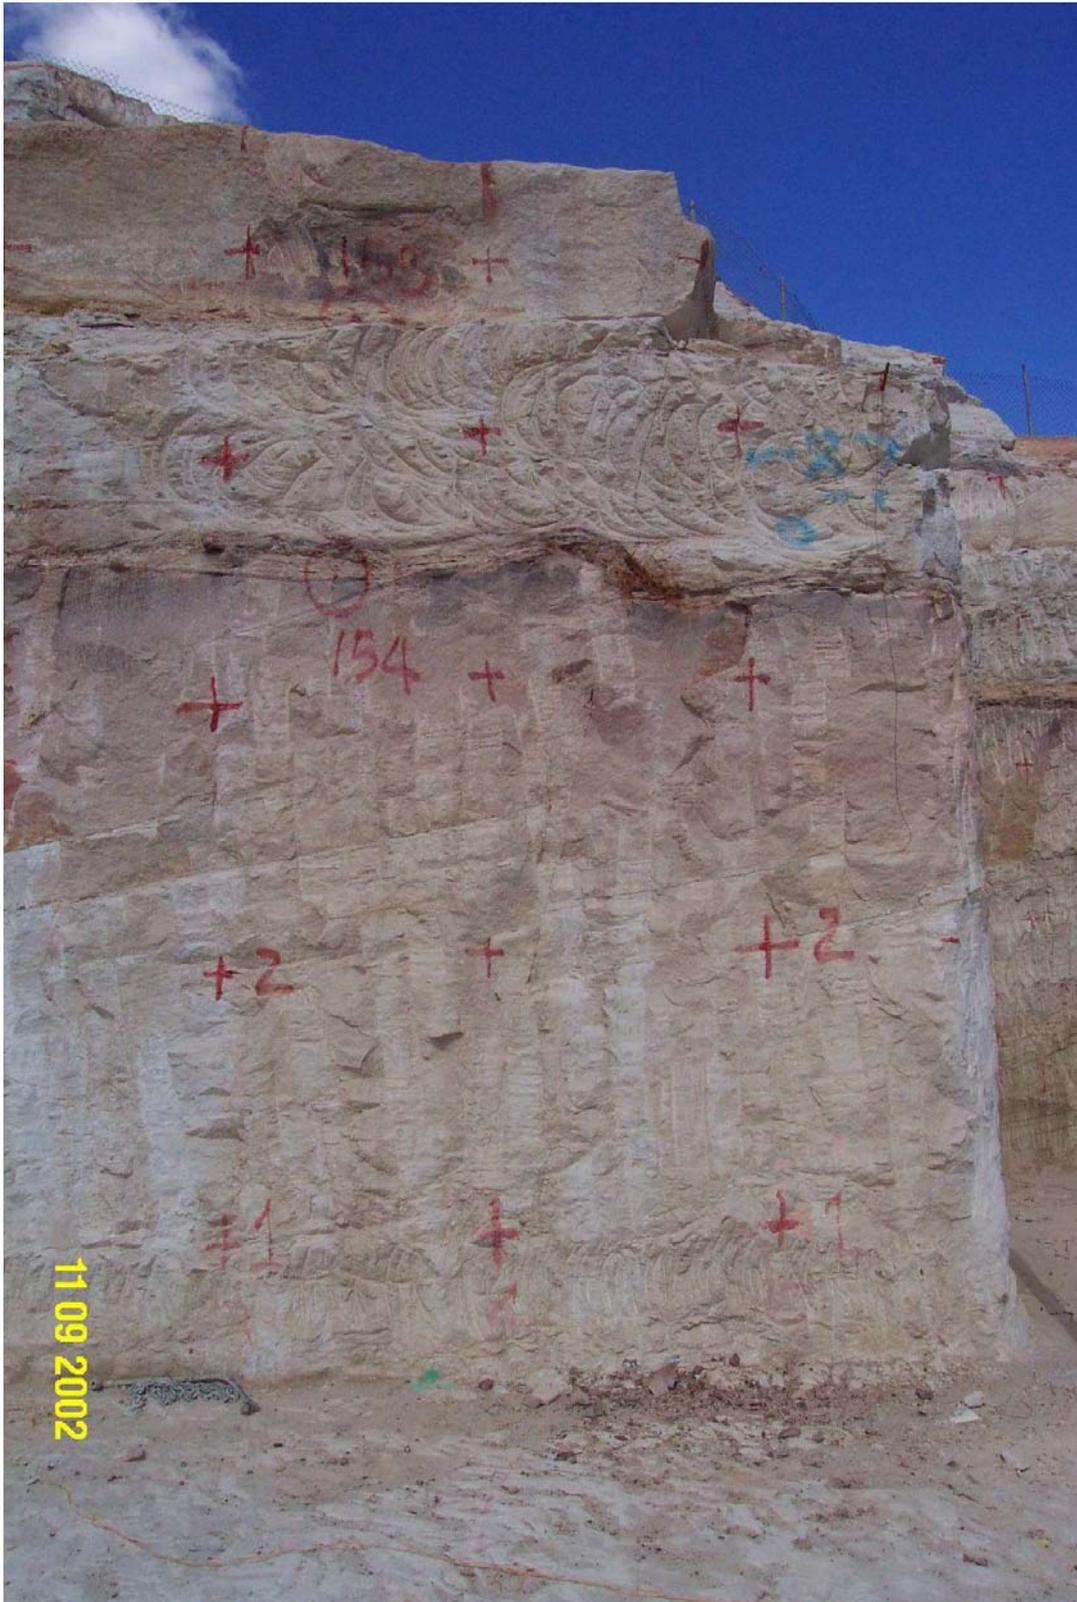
Photograph of western fault strand on southern wall of the reactor building excavation. (Red crosses indicate a 1 metre grid)
